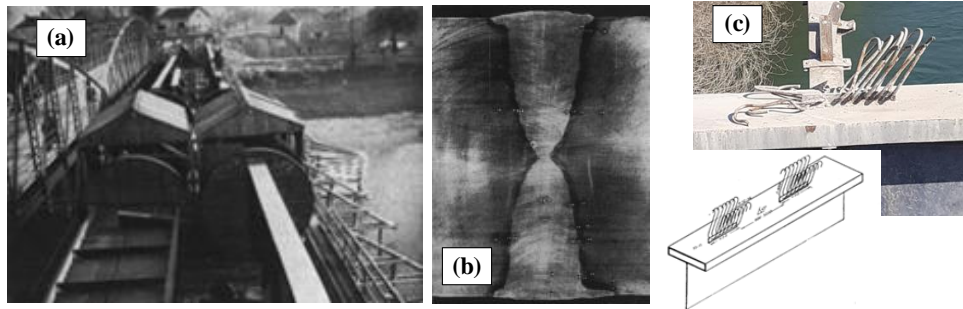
Details from the building process [11]. (a) welding technology, (b) weld quality control, (c) technical detail of the shear connector between the main girder and a concrete slab
